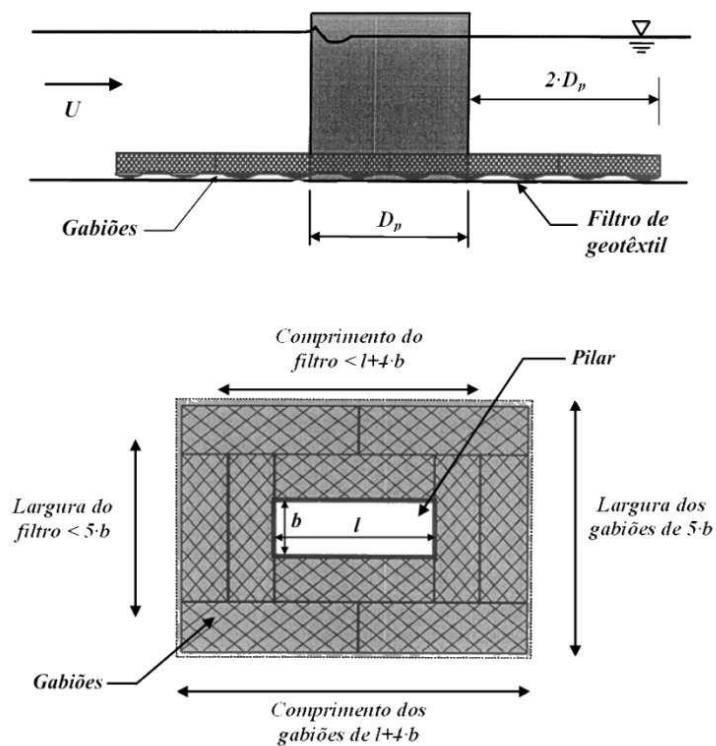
Construction arrangements for gabion systems on bridge pillars
